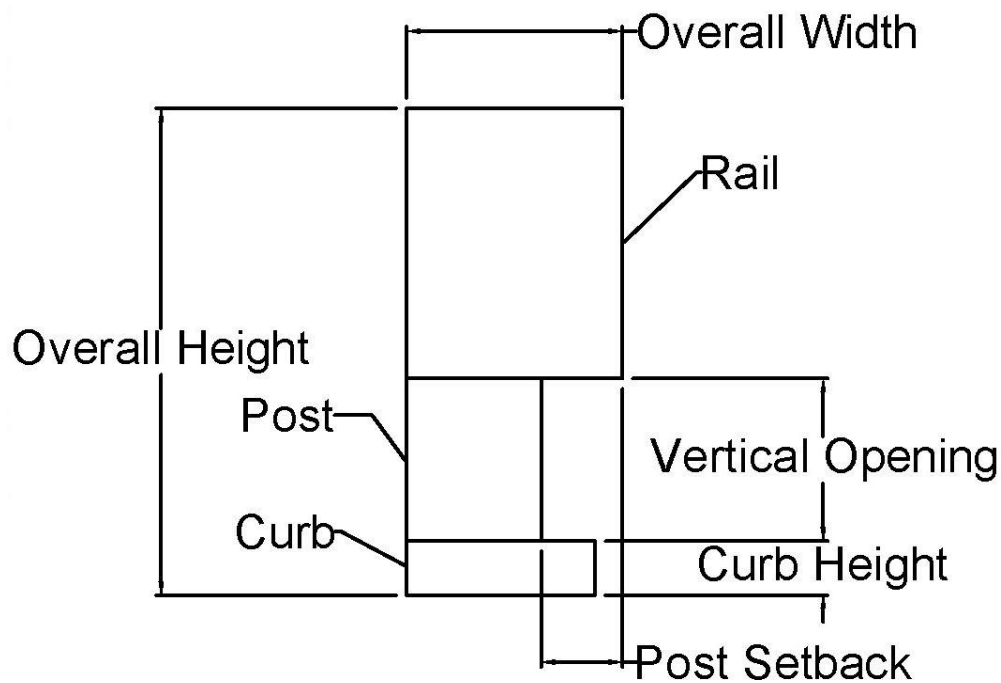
Open Concrete Bridge Rail General Dimensions Cross Section
